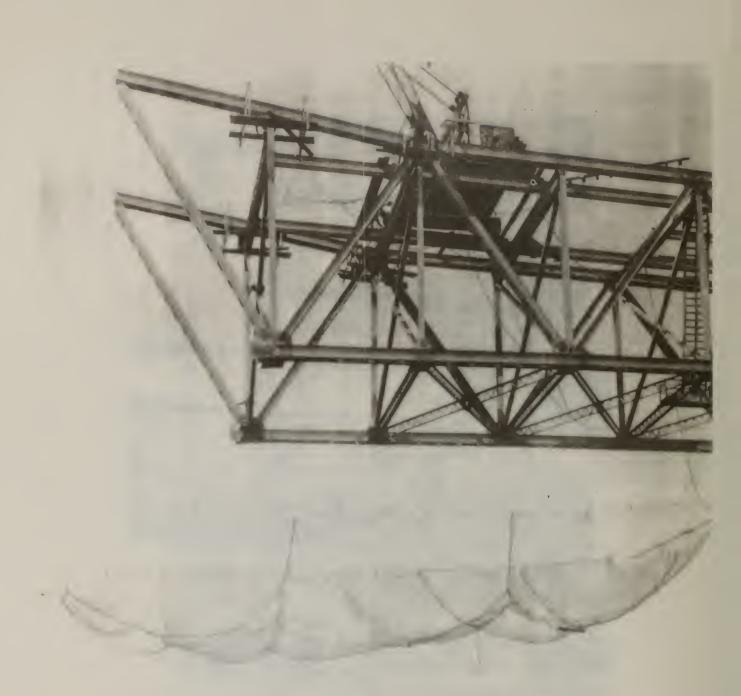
Safety nets on cables between bridge piers to protect workers installing new sections of bridge1/
